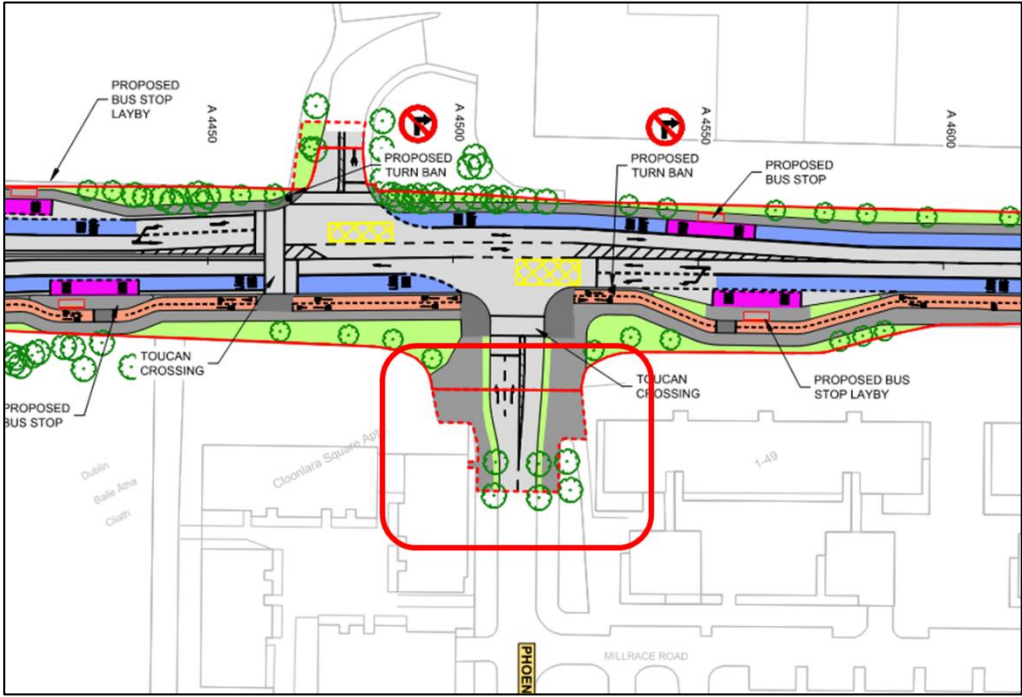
Proposed new Layout at Phoenix Park Avenue
